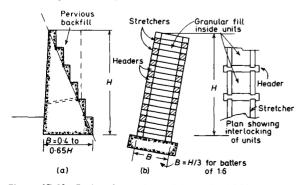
Designs for gravity retaining walls. (a) Mass concrete; (b) cribwork
